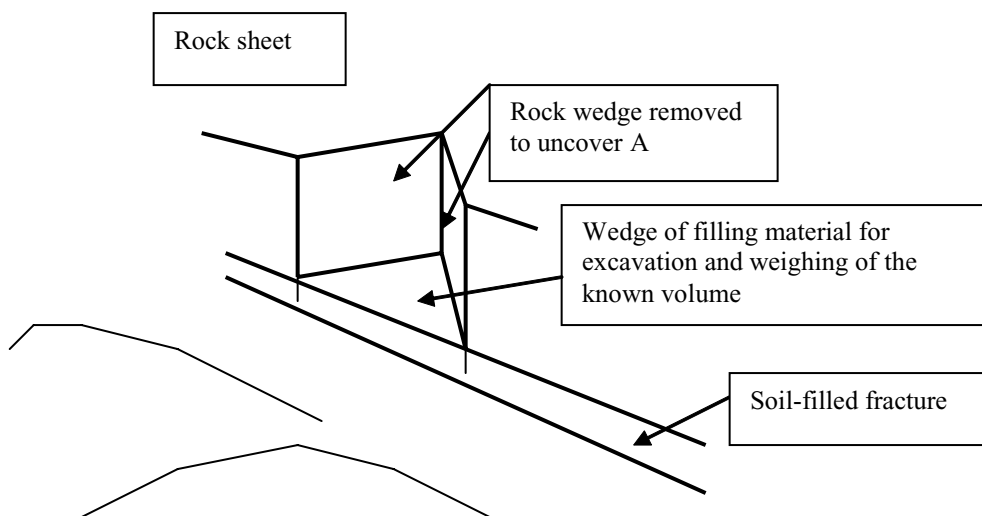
Method for determination of the density of fracture filling. 1) The rock wedge is removed to the top surface of the filling, by vertical and horizontal drilling with a pneumatic drill; the vertical holes are driven through the layer and the part through the filling is plugged. 2) The filling is dug out within a well-defined volume and the excavated material is weighed in the naturally moist- and dried states for calculation of density and porosity.
